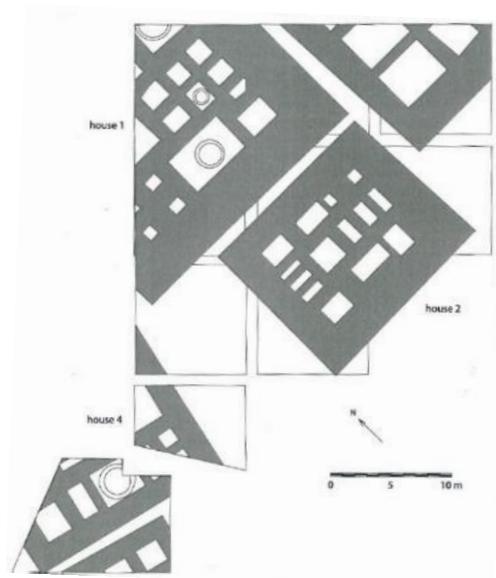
Domestic structures (?) at Tell el-Fara'in-Buto, plan (from SMOLÁRIKOVÁ 2008).
